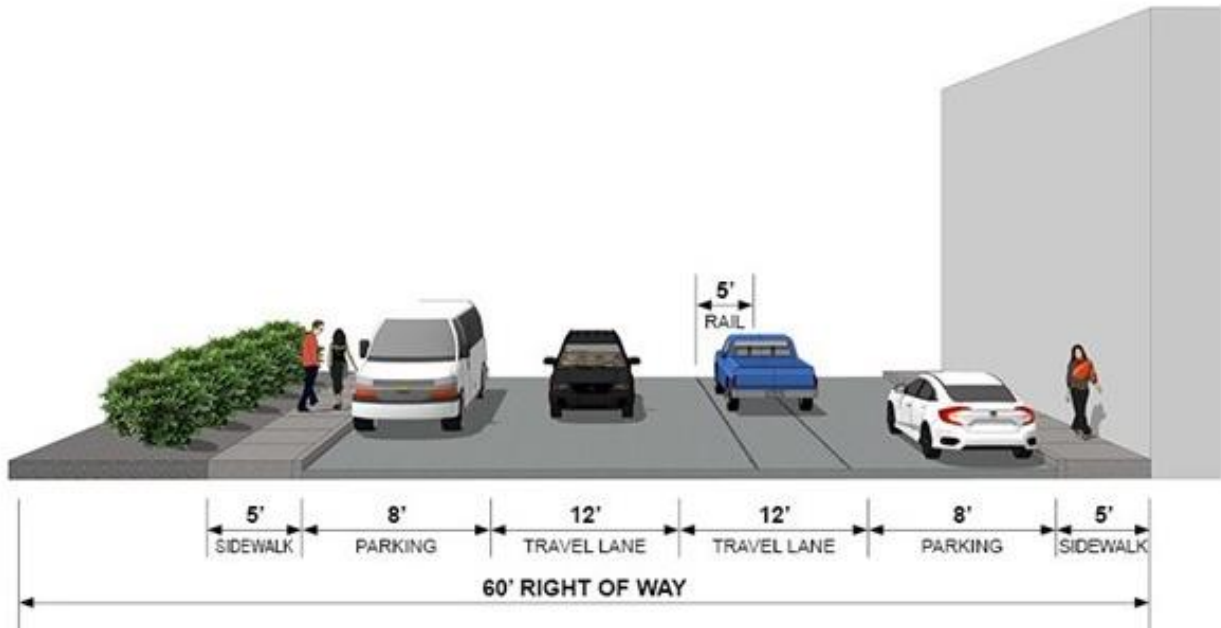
Existing Section D (Typical) - Front Street from Birch Ave. to Alder Ave.
